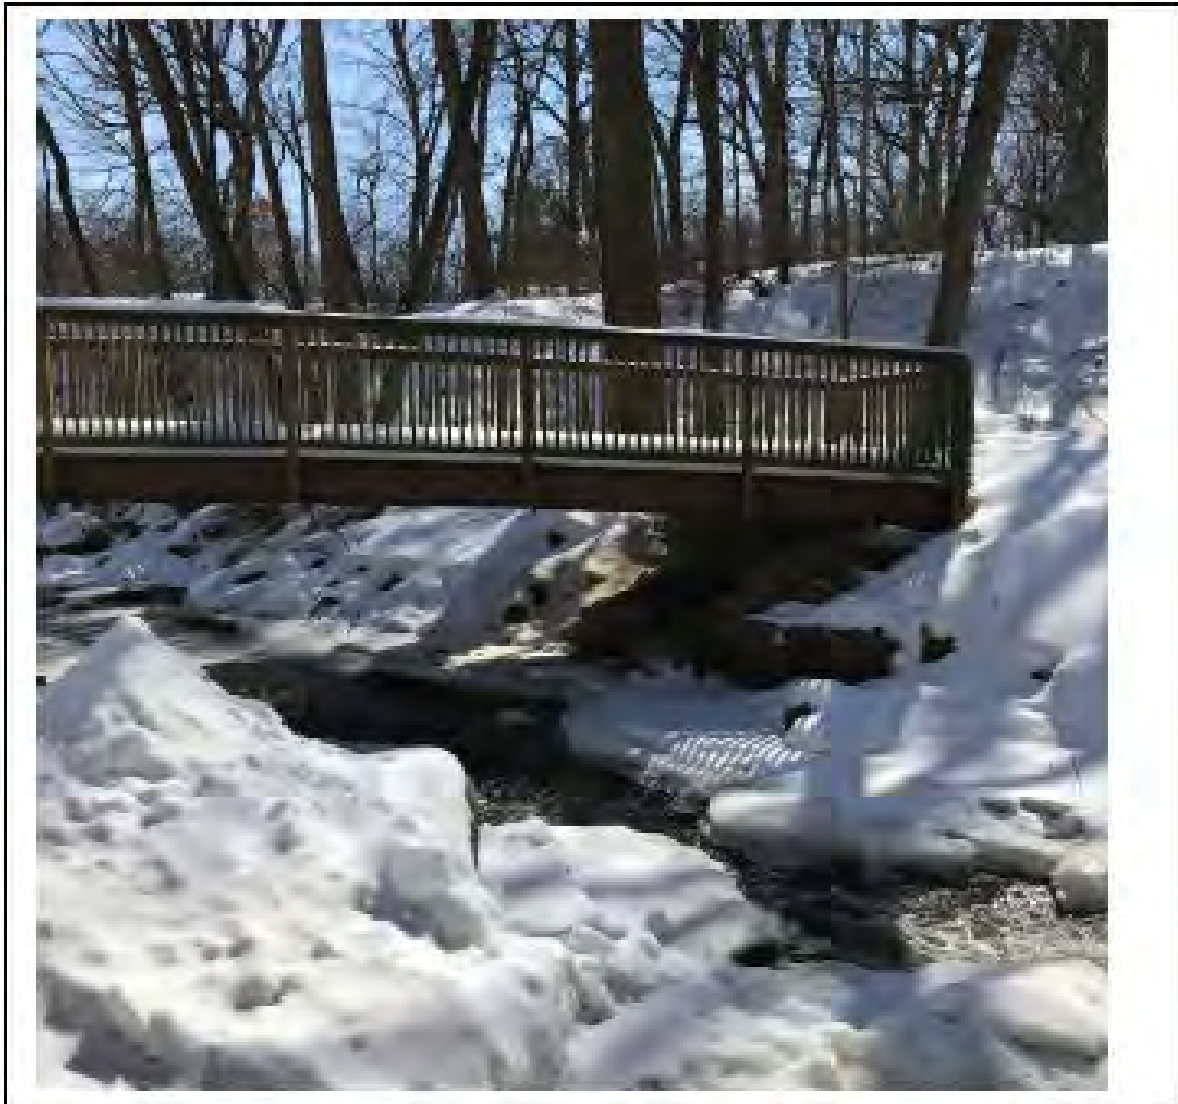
Site 25 (Marc 2019) taken at 43.103350, -89.495906. View of washout around bridge. Recreation trail to be resurfaced.
